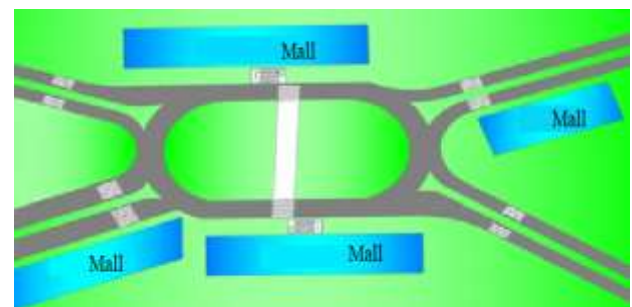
Shows the design proposal for the Roundabout of the Yidr Road
